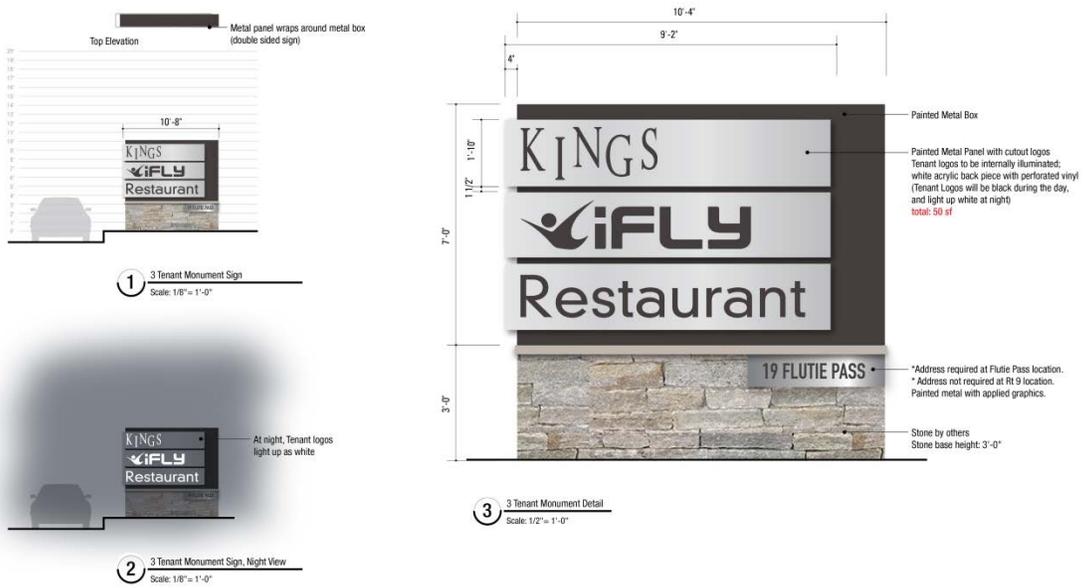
Figure D. Sign Location: E. Ground Mounted Tenant Identification Half Wall Sign
